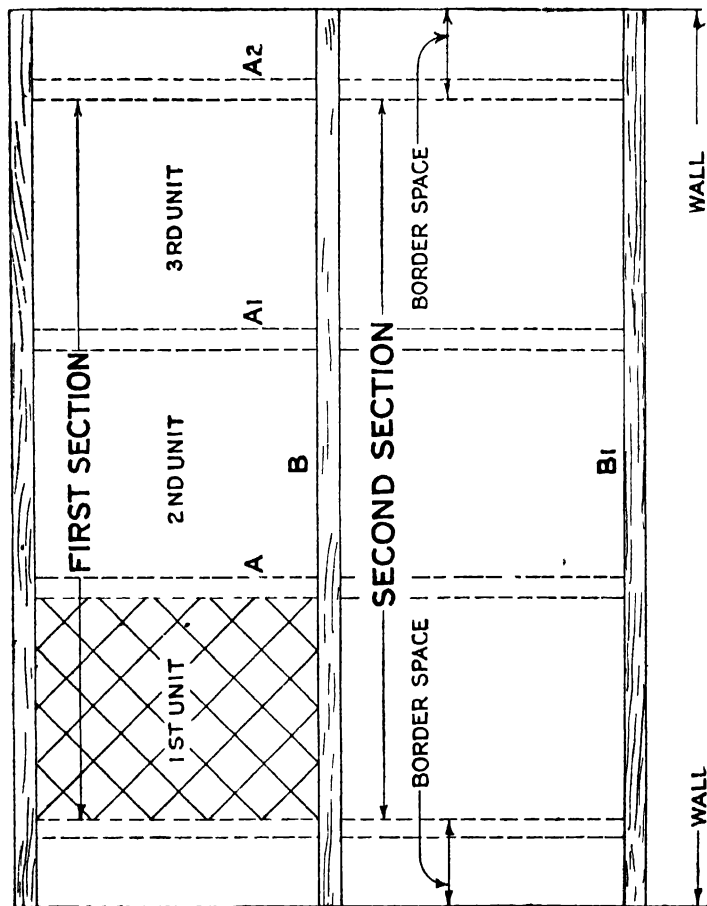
Laying tile floor unit by unit and section After laying the first unit, cross strip is moved from position A, to position A<sub>1</sub>, and A<sub>1</sub>, for laying 2nd and 3rd units respectively After thus completing the first section screed strip B, is moved to position B<sub>1</sub>, for the second section and so on until the entire floor area is covered, or in case of a border, the area within the border as shown
